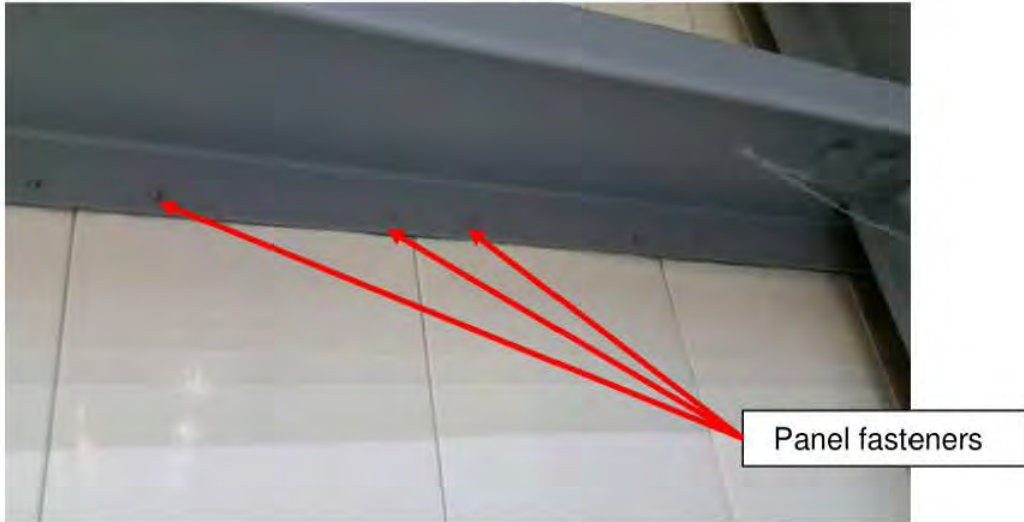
General View of Blowout Panel Fasteners to Girt Flange
